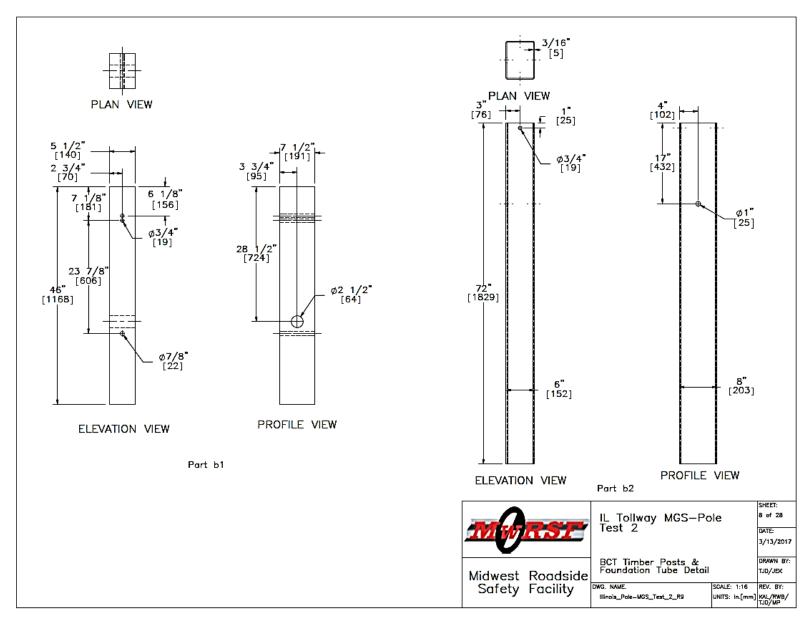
BCT Timber Posts and Foundation Tube Detail, Test No. ILT-2
